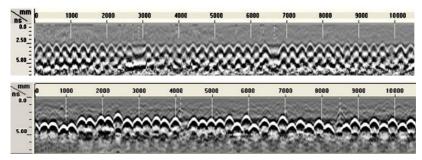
Radargram of dowels positions measurement in concrete road pavement transversal joint – variability of dowel positions
